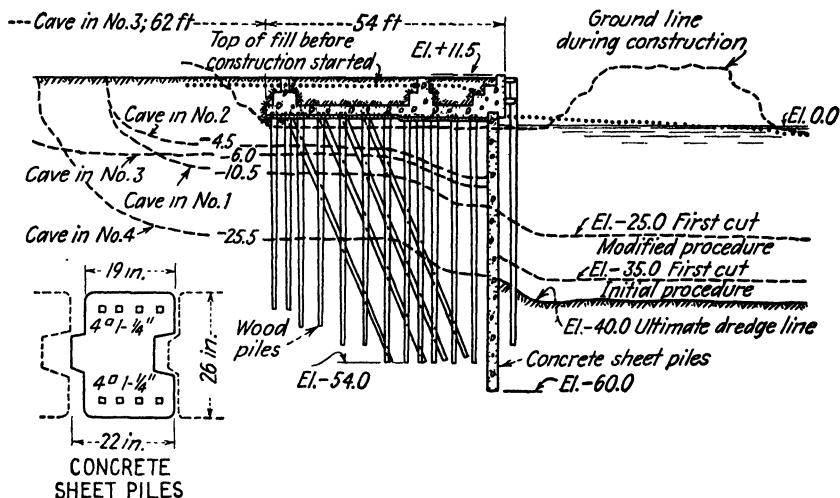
Heavy relieving platform on wood piles with reinforced-concrete sheet-pile bulkhead of the sunk-wall type. Fine sand leaked through gaps between sheet piles, causing cave-ins, until repairs were made. (After J. C. Gebhard, Ref. 145, 1948.)
